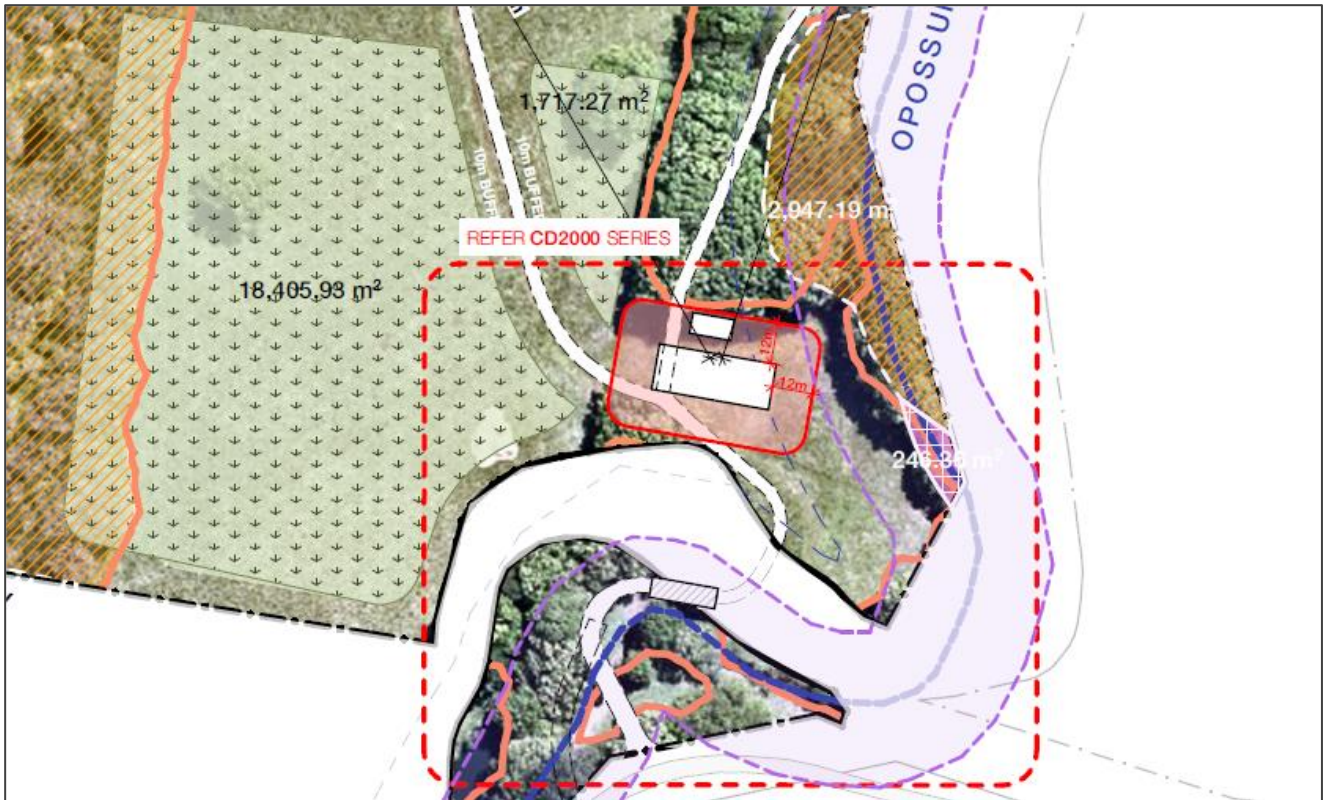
Farm/office building with a 12m APZ surrounding the building.
